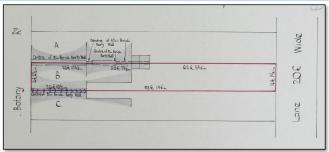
Plan from the NSW Certificate of Title 1956, shows Lot B (No. 1017) with similar building layout as Lot A (No, 1015)
